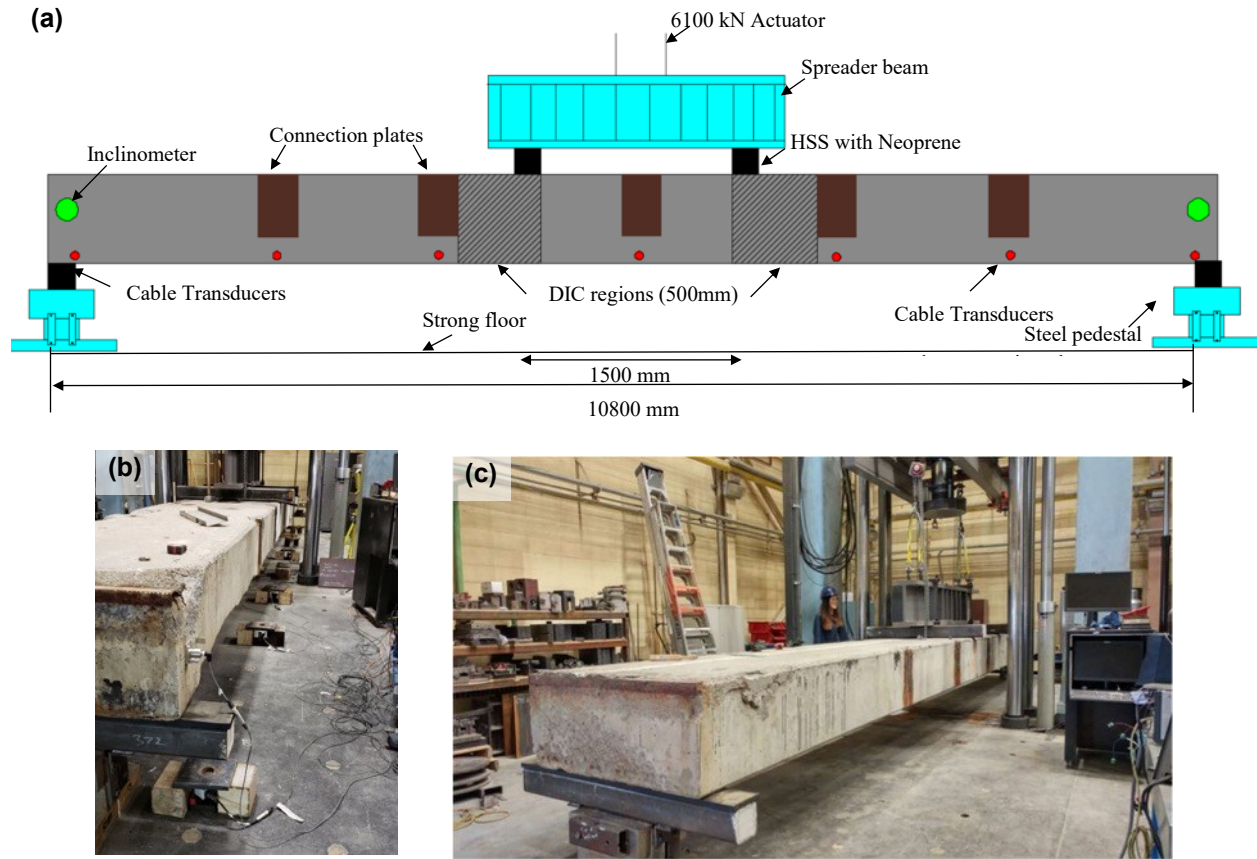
Test setup and instrumentation (a) Elevation view of test setup showing location of load points and instrumentation (b) Photo showing placement of sensors (c) photo showing overall girder in place.
